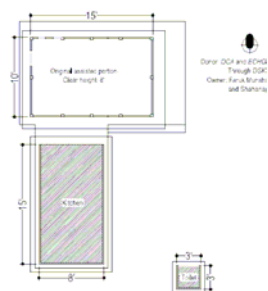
Showing Assisted shelter-type 8 (DanChurchAid and ECHO); plan, view and nearby safe-water tank (Author, 2008)
